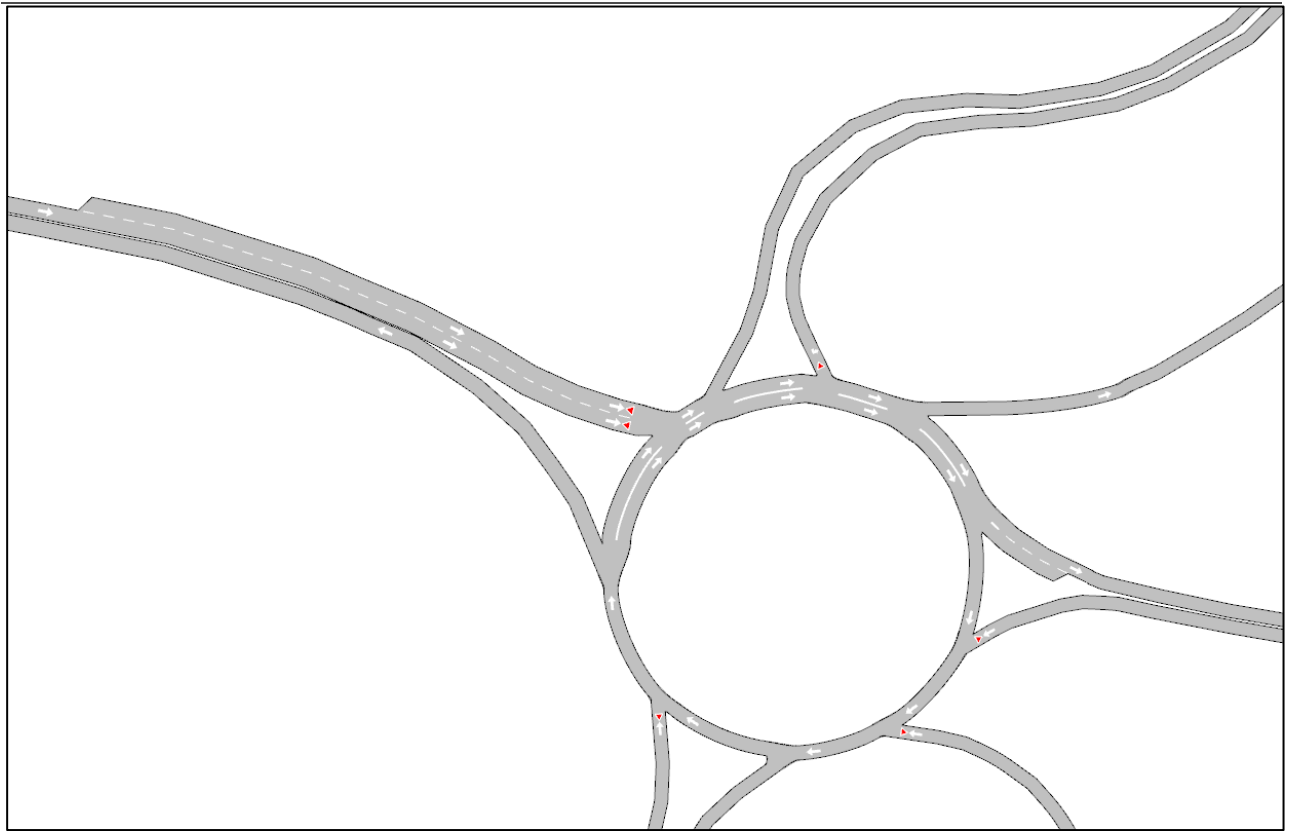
2031 Stoney Camp Road /Mount Lindsay Highway Roundabout
